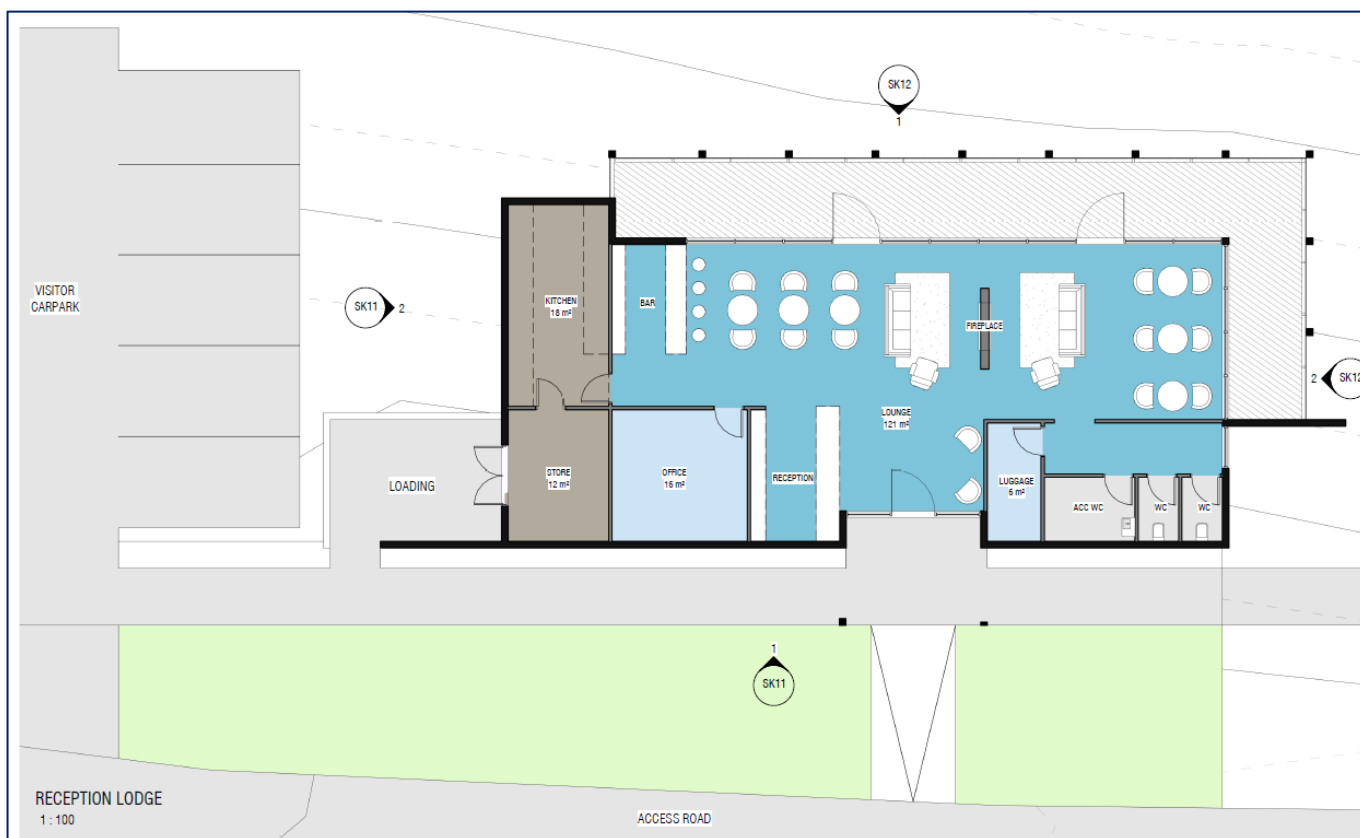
Floor Plan of Communal Lodge, with Restaurant
